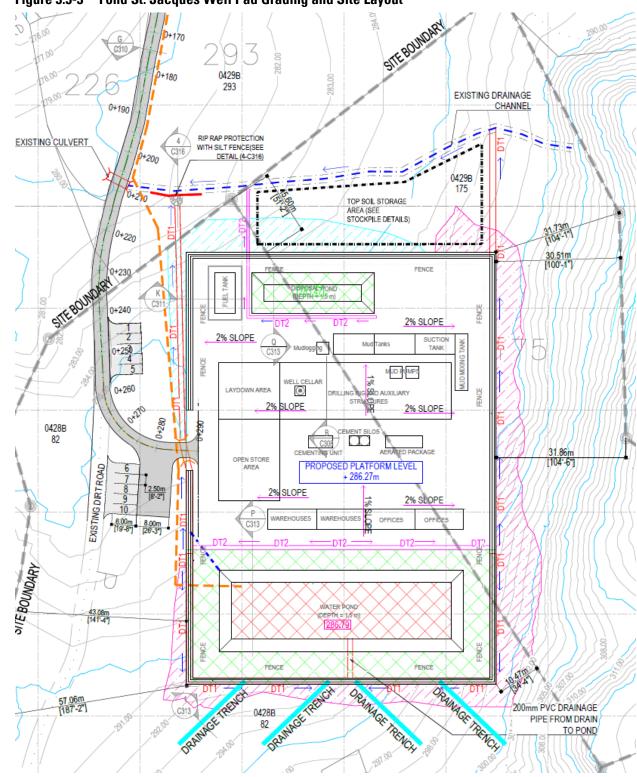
Fond St. Jacques Well Pad Grading and Site Layout
